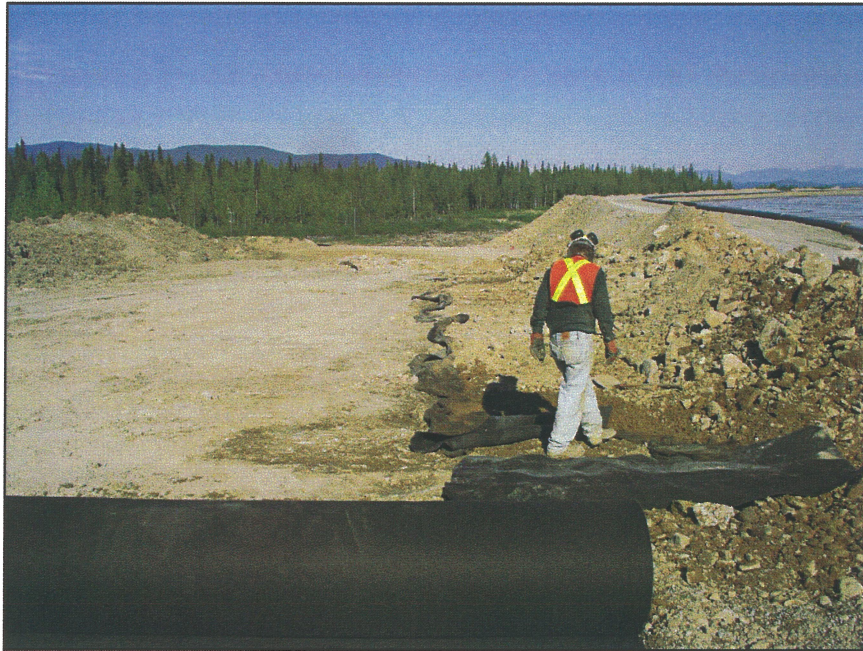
Geotextile placed on the Perimeter Embankment prior to placement of the shell zone.
